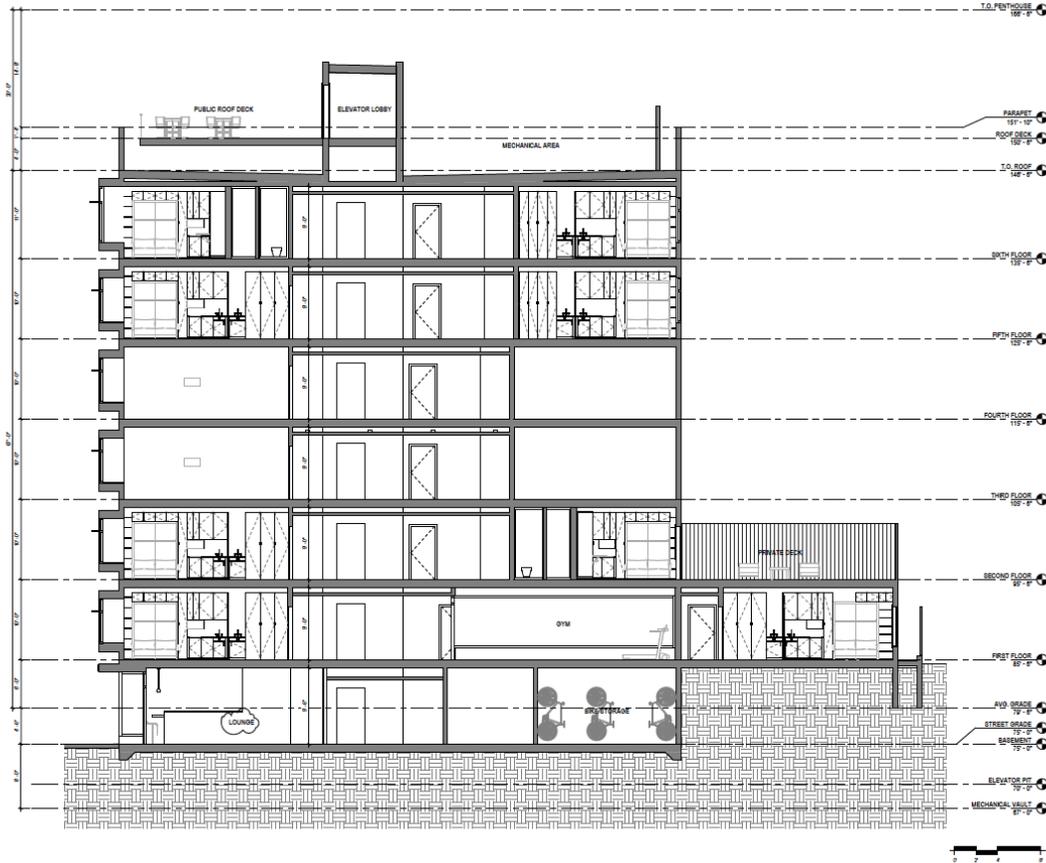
The existing slope of the site allowed for a basement programmed with amenity spaces including café, laundry room, and bicycle storage to be accessed directly from the sidewalk, giving the building the appearance of a 7-story building where only 6 are permitted. The first residential floor is at grade at the rear of the site, but one story up at the sidewalk.
